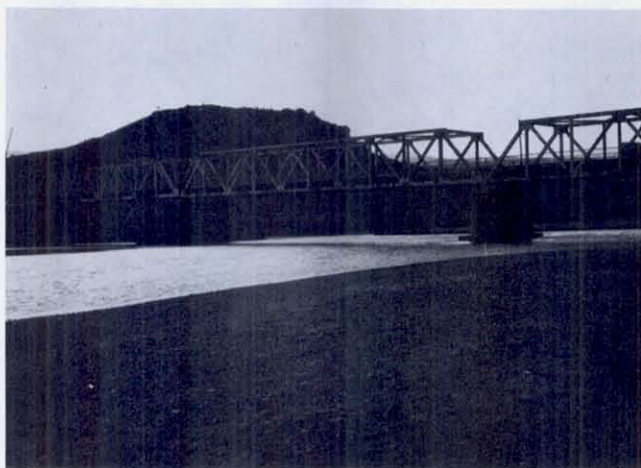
Looking upstream (north) at the steel bridge across the Murat River, 17 km SE of Bingöl, near Genc. Spans are numbered from left to right as 1, 2, 3, and piers as 1, 2. Pier spacing is 55 meters. The right end of each span is anchored so as to permit rotation only, whereas the left end of each is on rockers, which permit some longitudinal movement, but which are unstable, as shown in the following figure.
